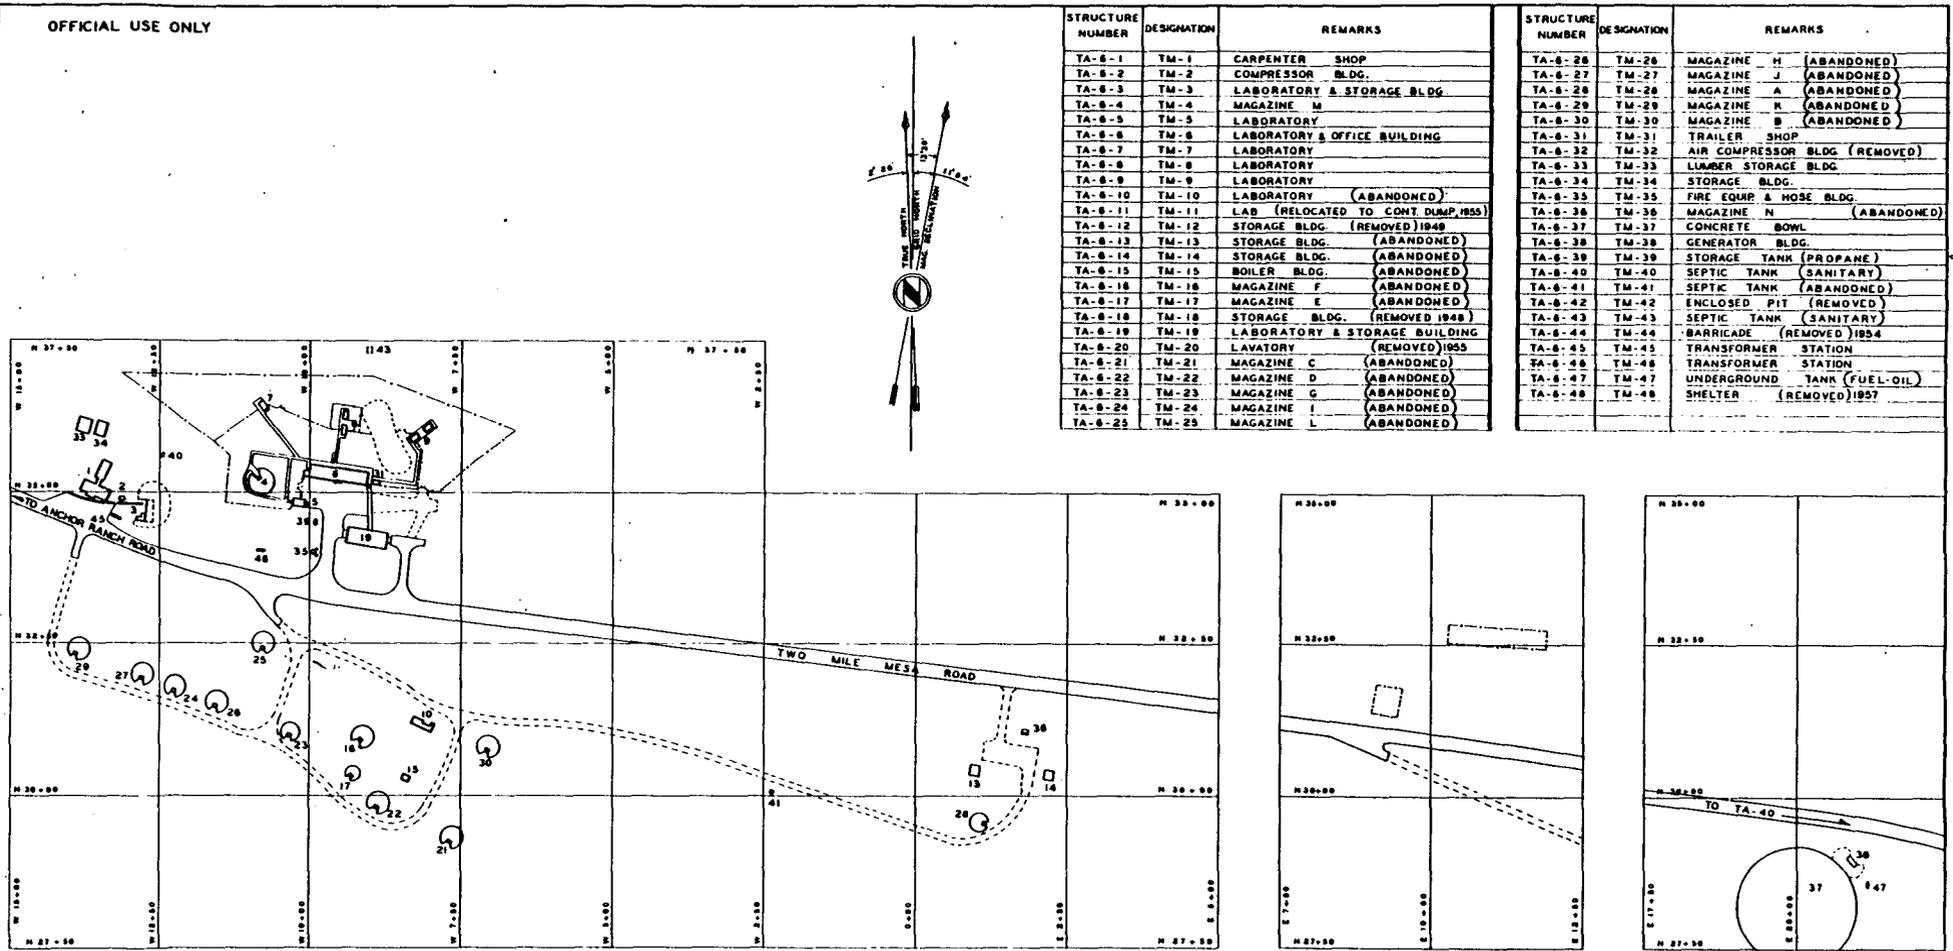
Structure Location Plan for TA-6 - Two-Mile Site (1961 Drawing from the LANL Technical Area Structure Location Plans)
